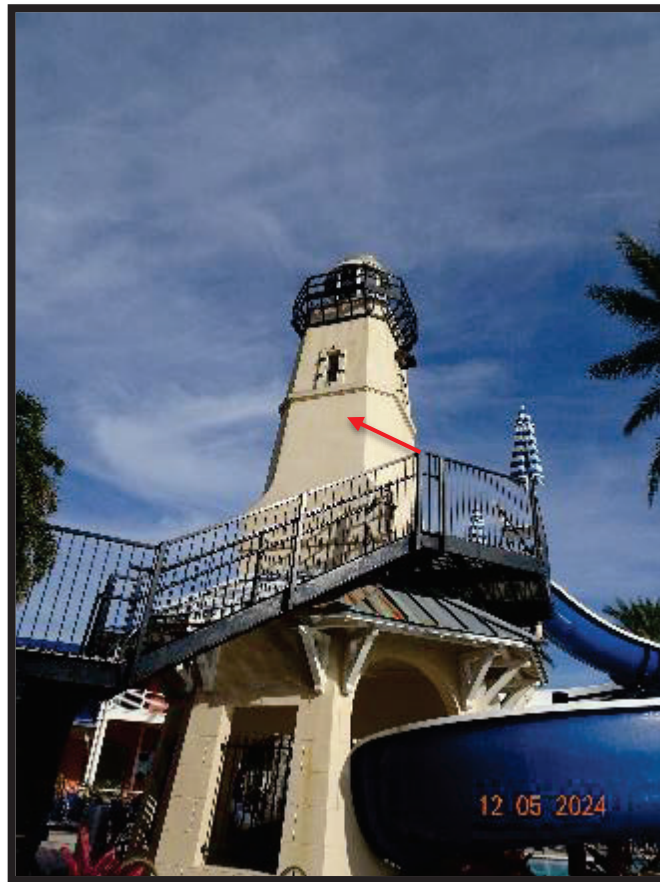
View of stains along the exterior face of painted stucco finish below metal bars around windows.
